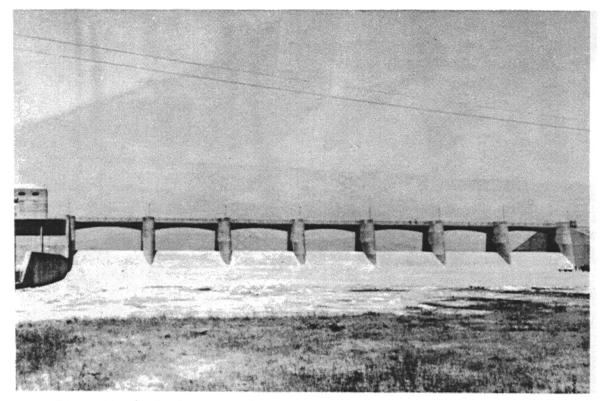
Spillway (Ogee type), with Control House and Outlet Works on left (view from downstream, below spillway apron).
